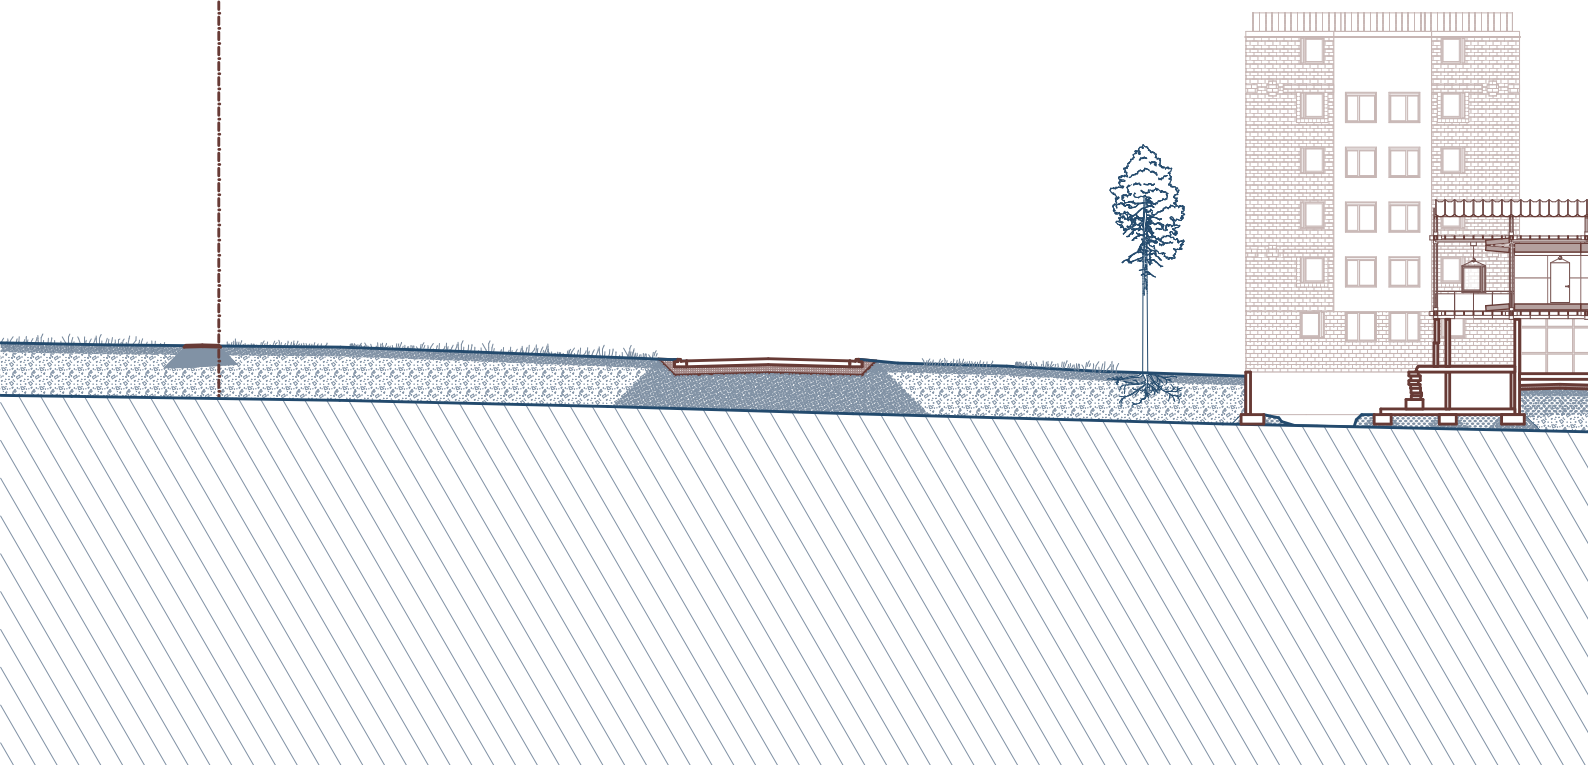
Design Proposal Reacts to Built Ground: Concrete Foundation
